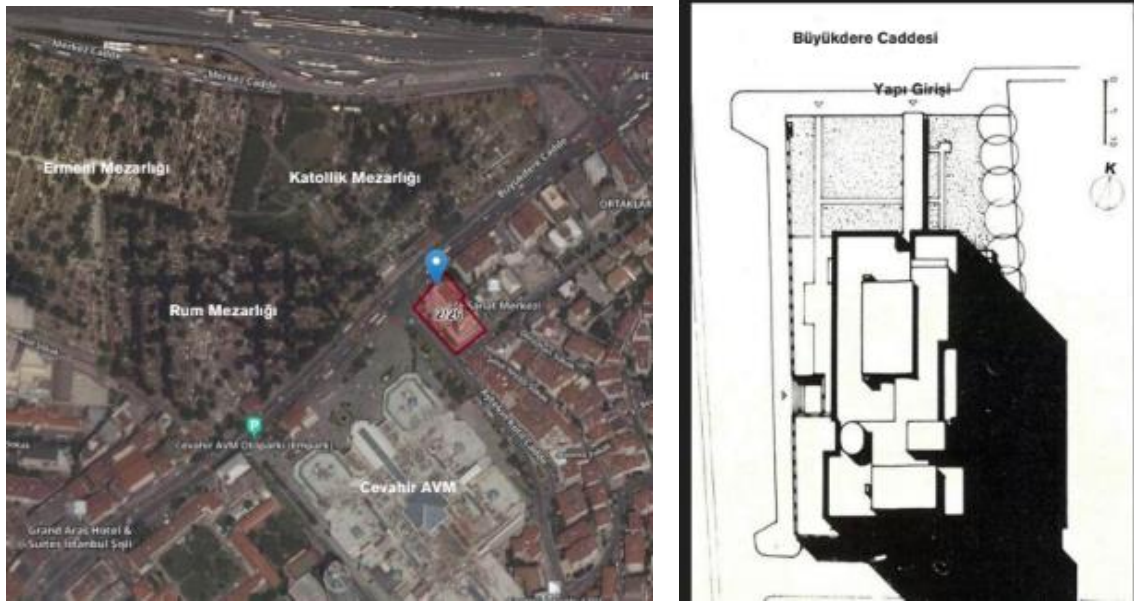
The location of Istanbul Hukukcular site (google earth), the site plan of building
